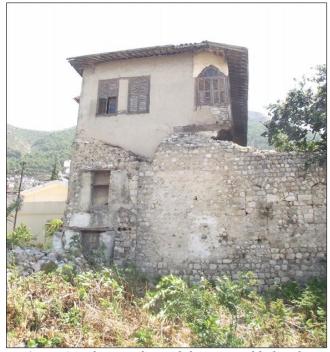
The corridor and the eaves added to the north-eastern façade of the building in a later period
